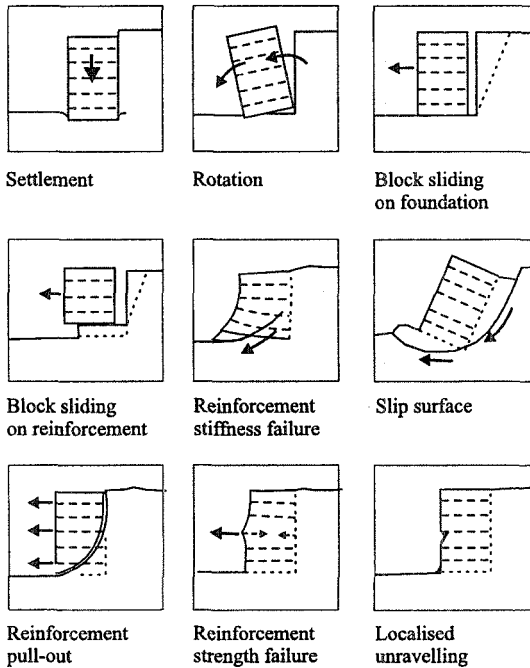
Possible failure mechanisms for reinforced soil wall
